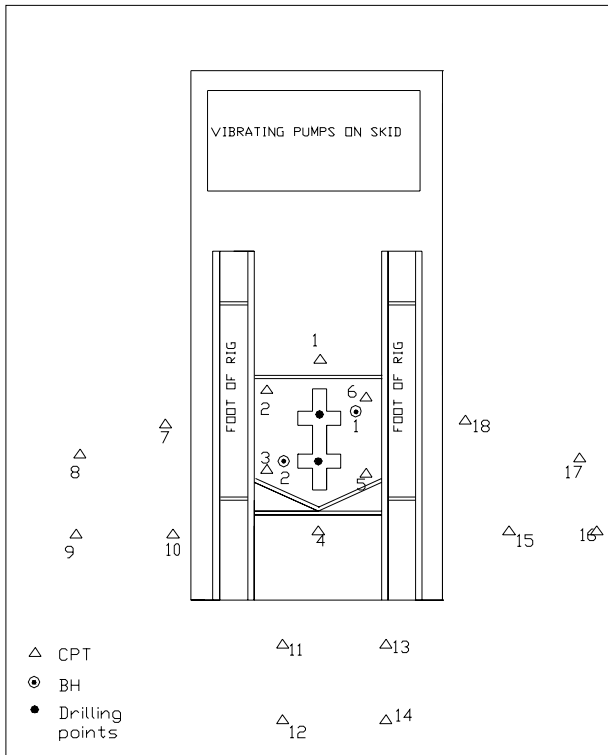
Typical drilling slab showing cellar pit and positions of geotechnical boreholes and cone penetration tests
